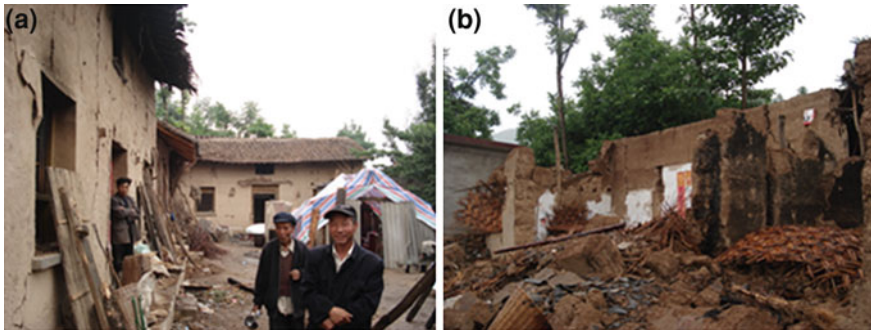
The collapsed raw-soil structure buildings, a before earthquake, b after earthquake
